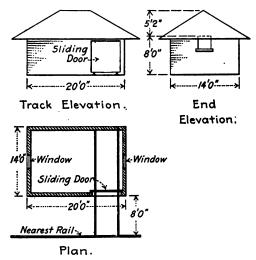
A.—Section Tool House, Roadway Buildings. (Am. Ry. Eng. Assn.)
